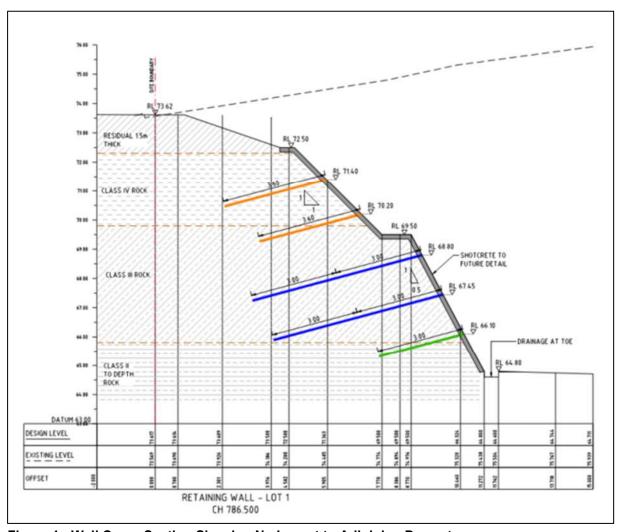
Wall Cross Section Showing No Impact to Adjoining Property
